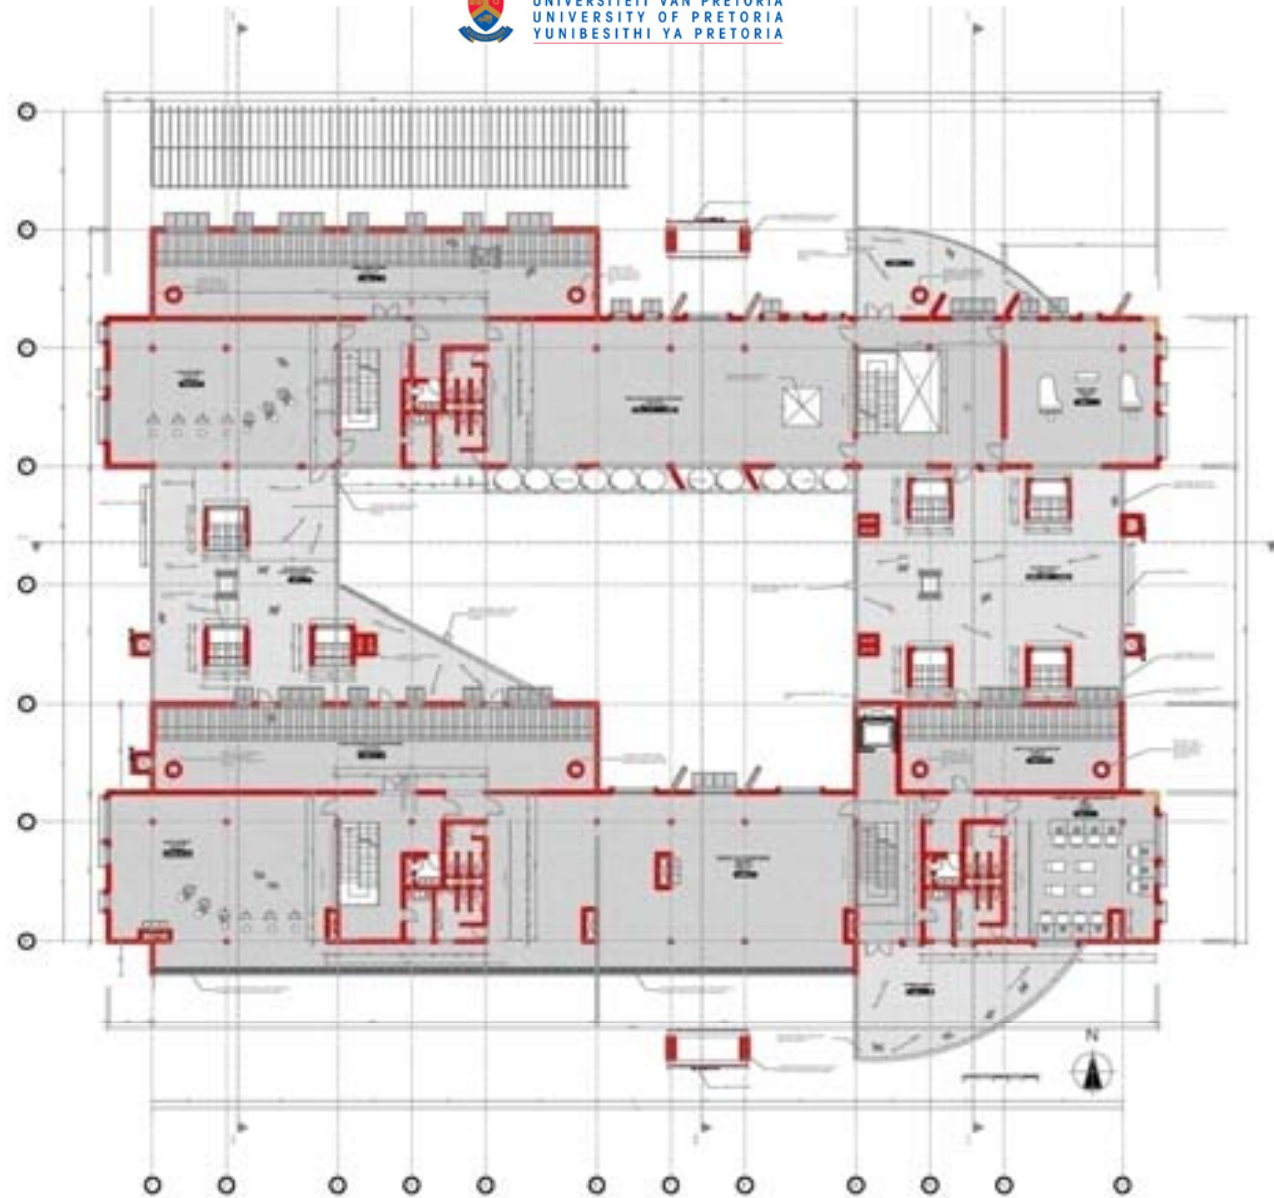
Basement floor plan. Scale 1:500. (Author, 2009).
